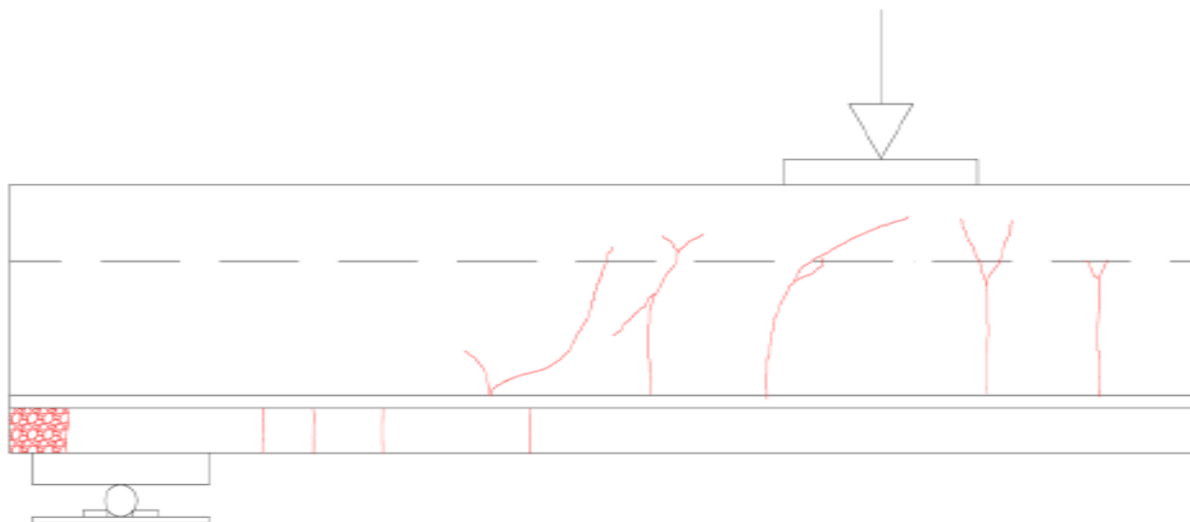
Cracking pattern after failure (Shear test) [61]
